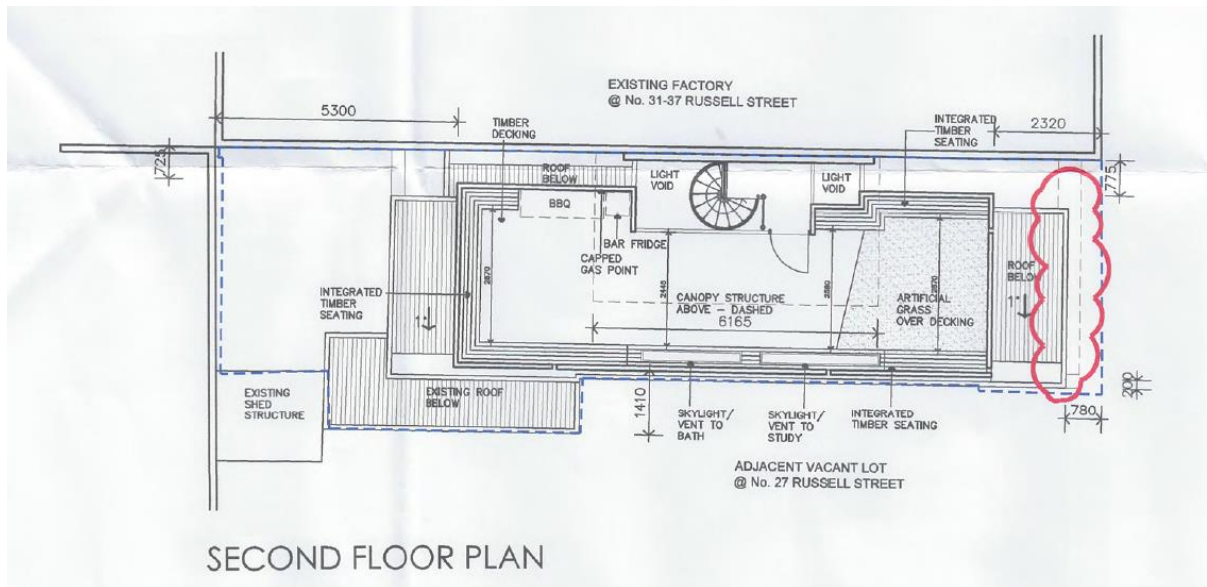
Second floor plan of No. 29 Russell Street (as per plans endorsed as part of Planning Permit PLN13/0127).
